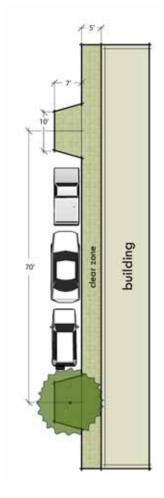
On-street parking on TOD Local Street without street tree/furniture zone.
